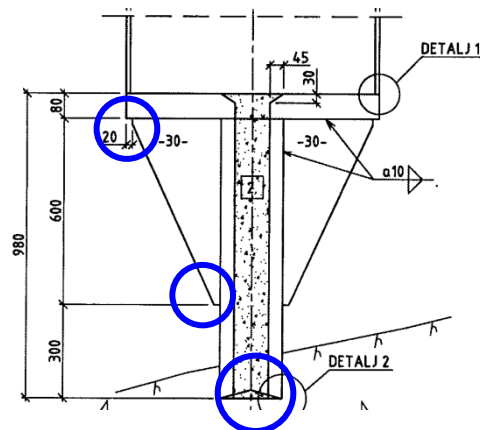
Pile shoe with hollow ground end face and chamfering of corners on stiffening plates
